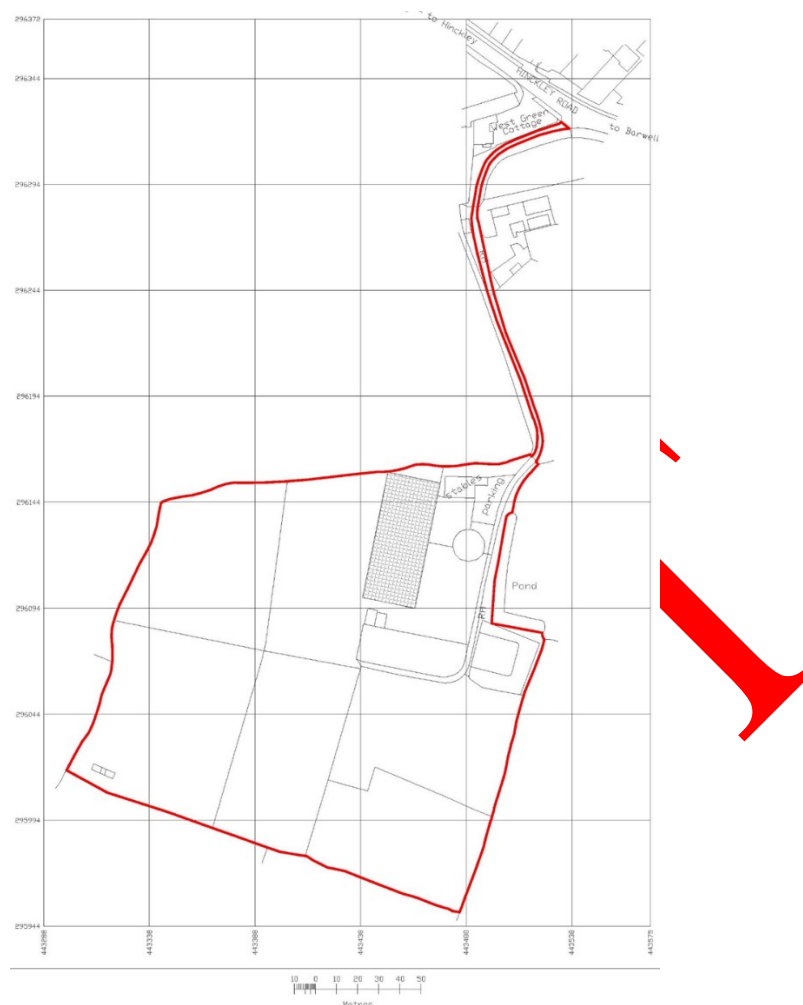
Detailed plan of site (provided by client) showing the location of the ménage (grey) next to the stables. Scale 50m.
